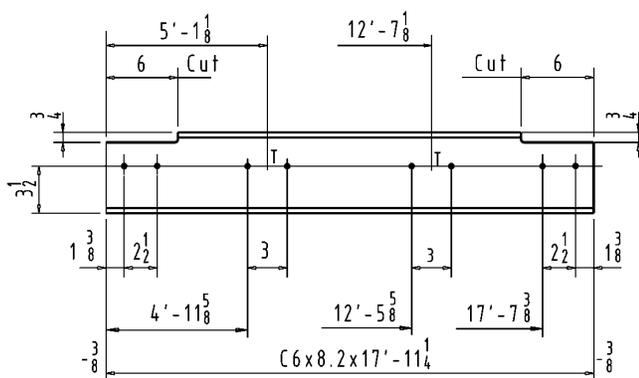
Detailed layout for the connection of a girt to a column flange.
